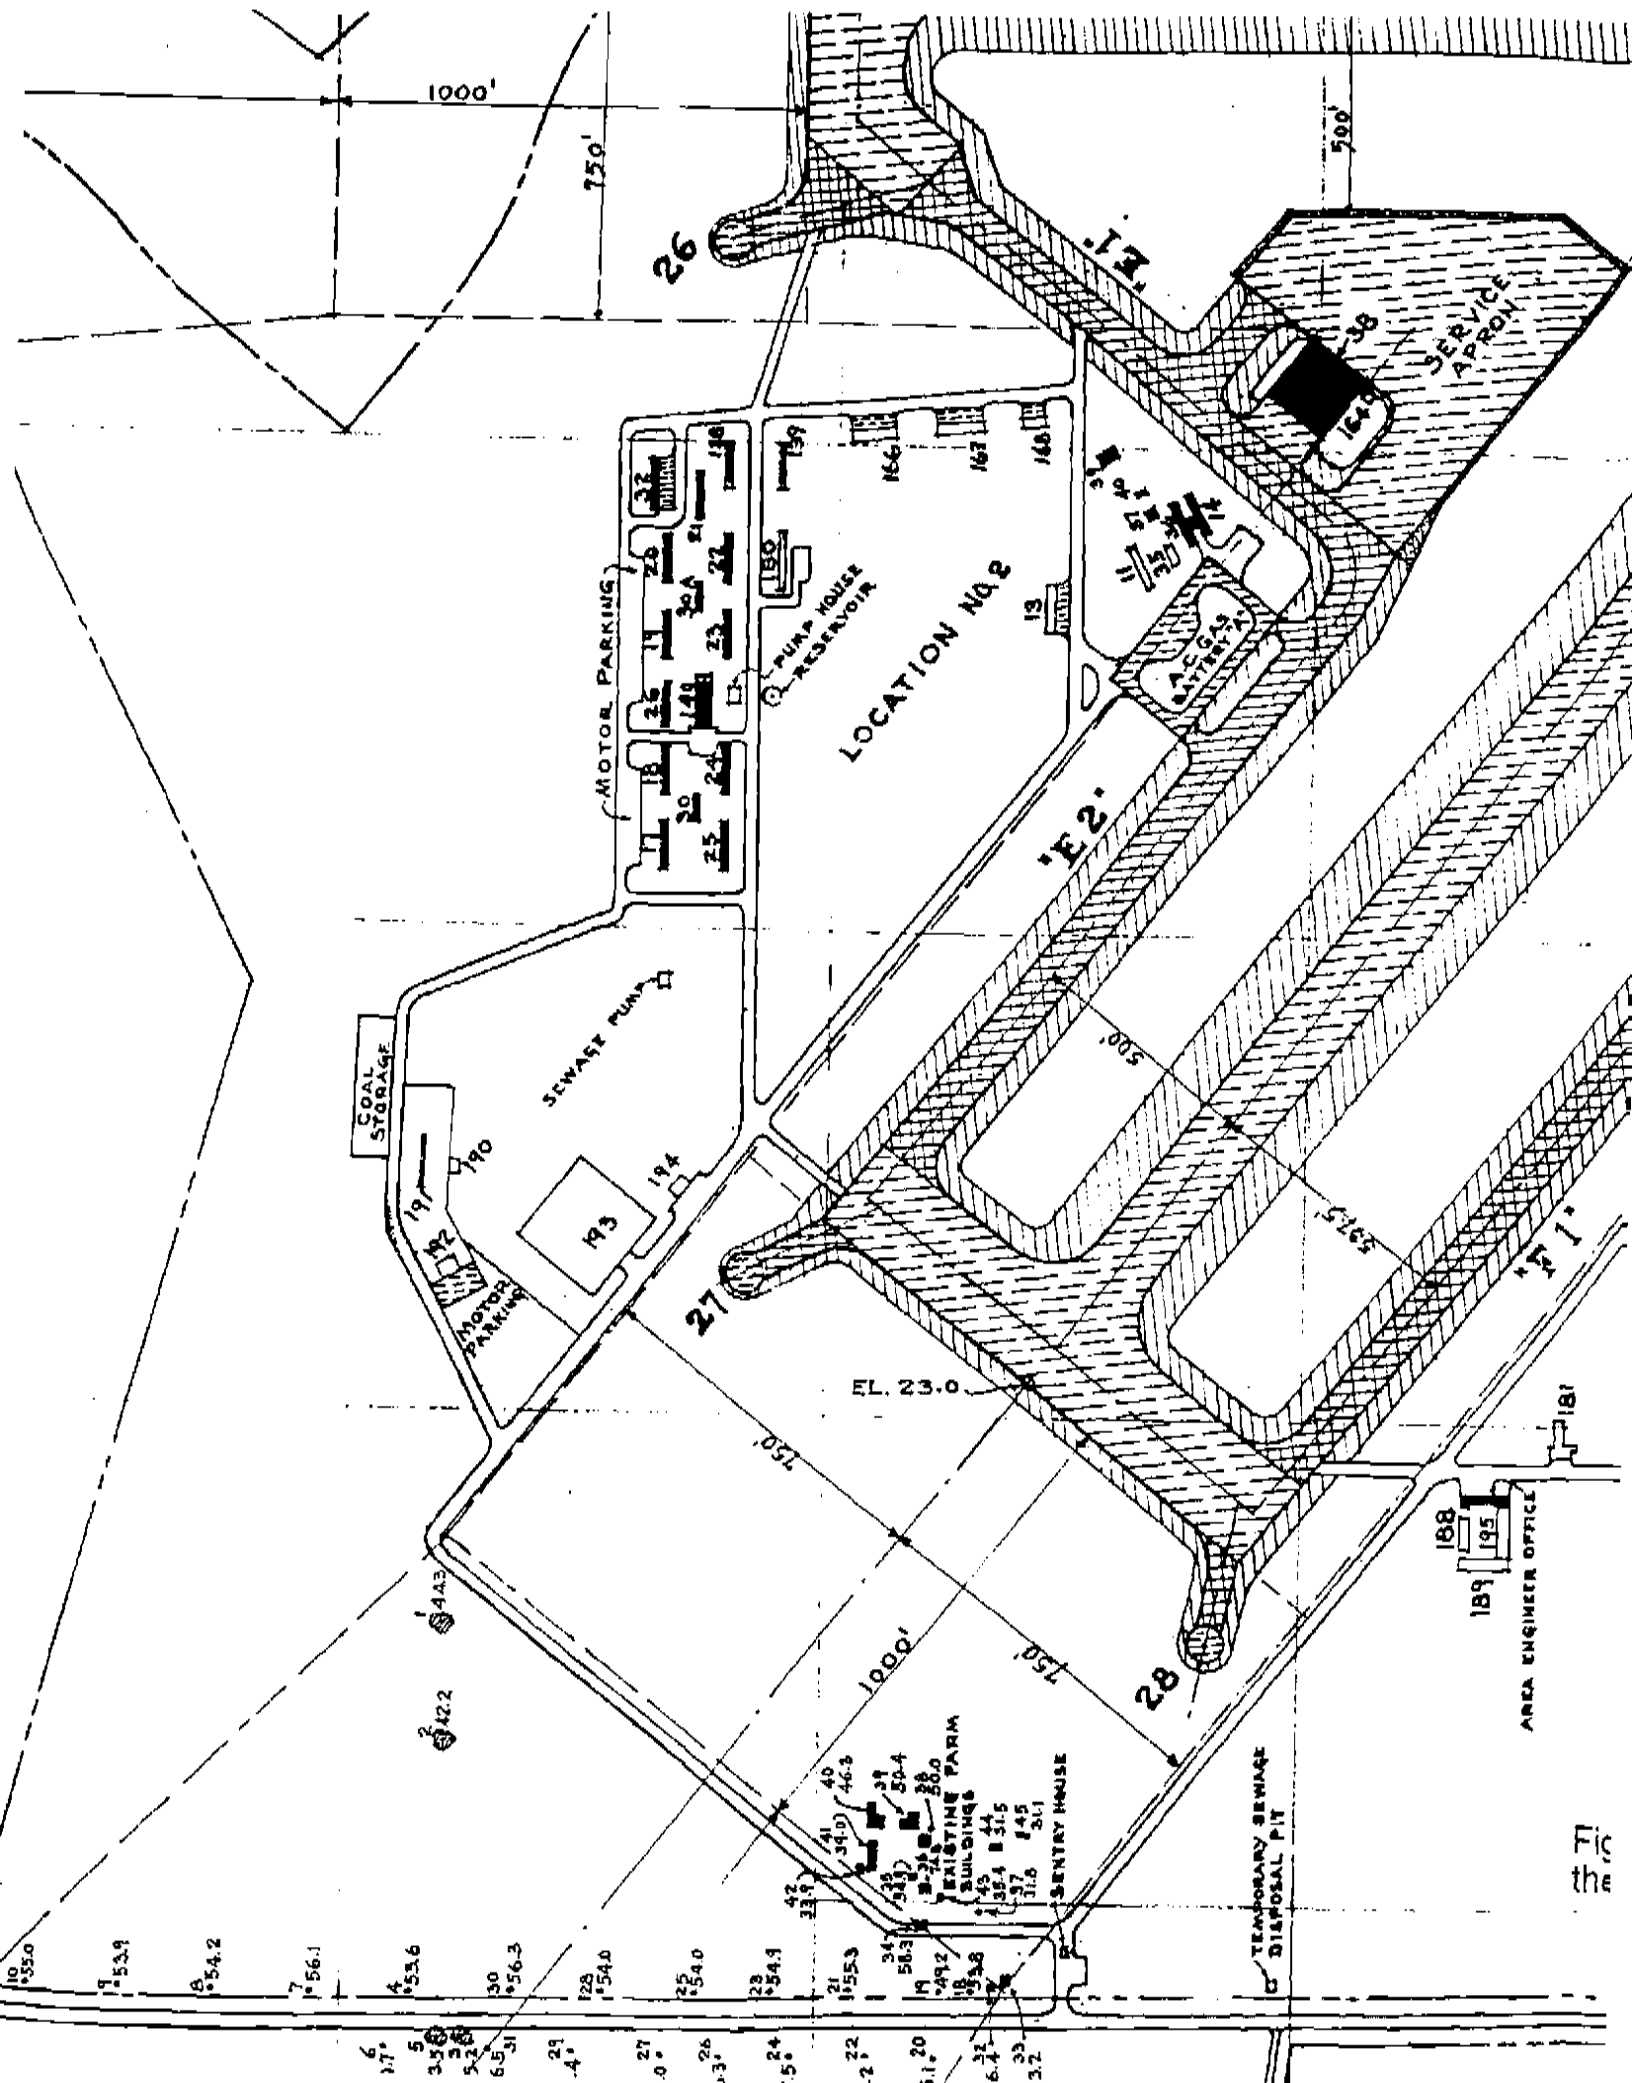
Detail of a Dover Air Force Base development plan dated 1966. Existing buildings that were to be demolished are shaded. This plan demonstrates the difference between the present ground plan and the postwar ground plan. 1" = 200'
